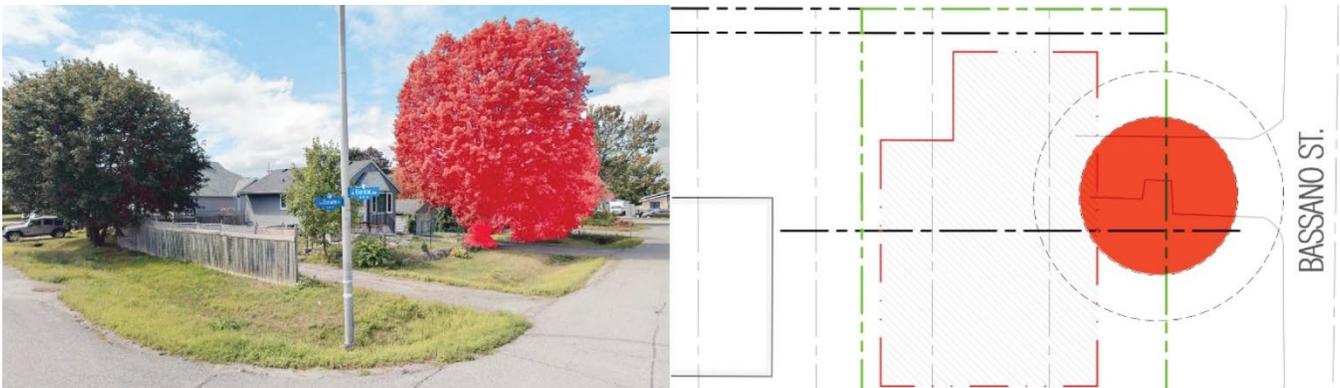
Street view and site plan images indicating significant Bur Oak to retain.
